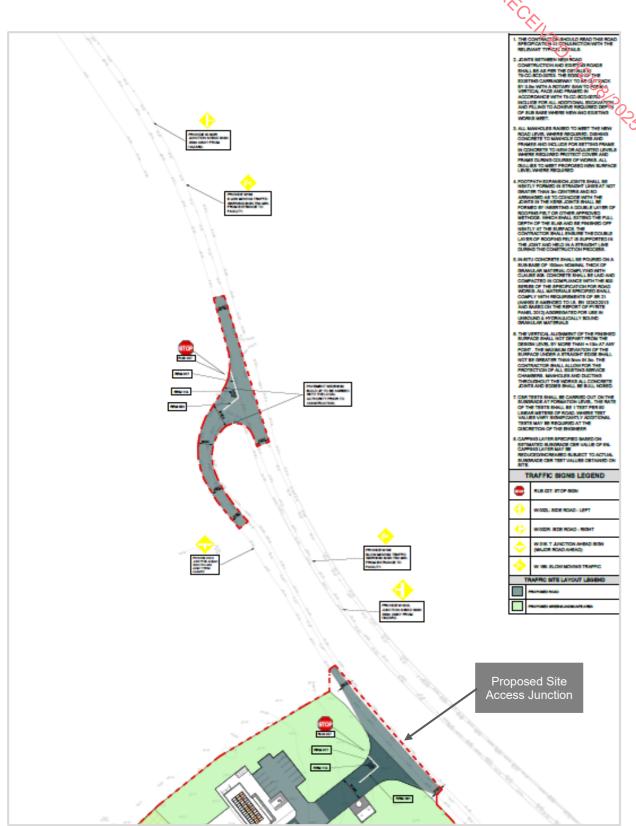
Proposed Site Layout Including Road Markings and Traffic Signs. Cropped (ORS Ref: 231240-ORS-ZZ-00-DR-TII-1200)
